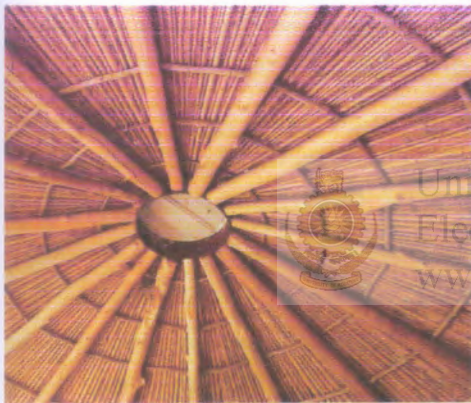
roof constructed with bamboo site harvested plant materials such as bamboo are useful wherever they're abundant
